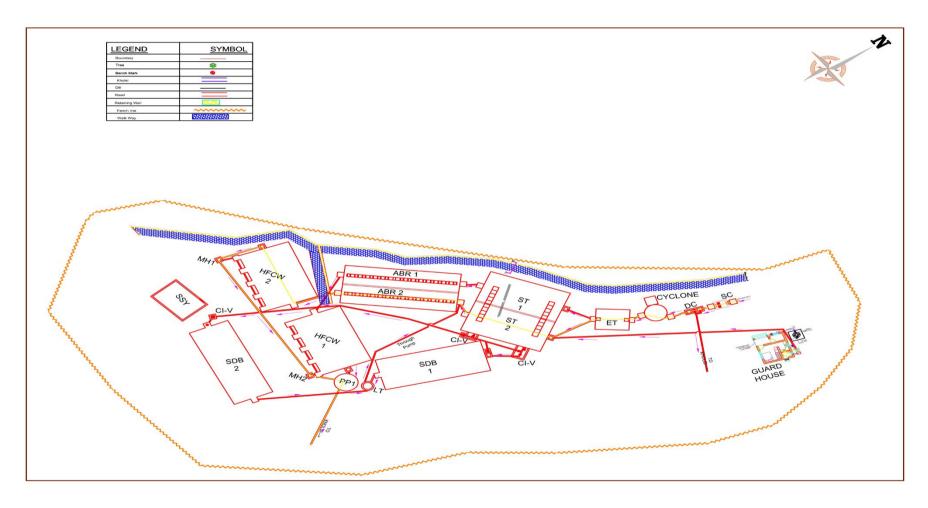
Figure IV-IV: Layout plan of the Proposed Gairawari WWTP
